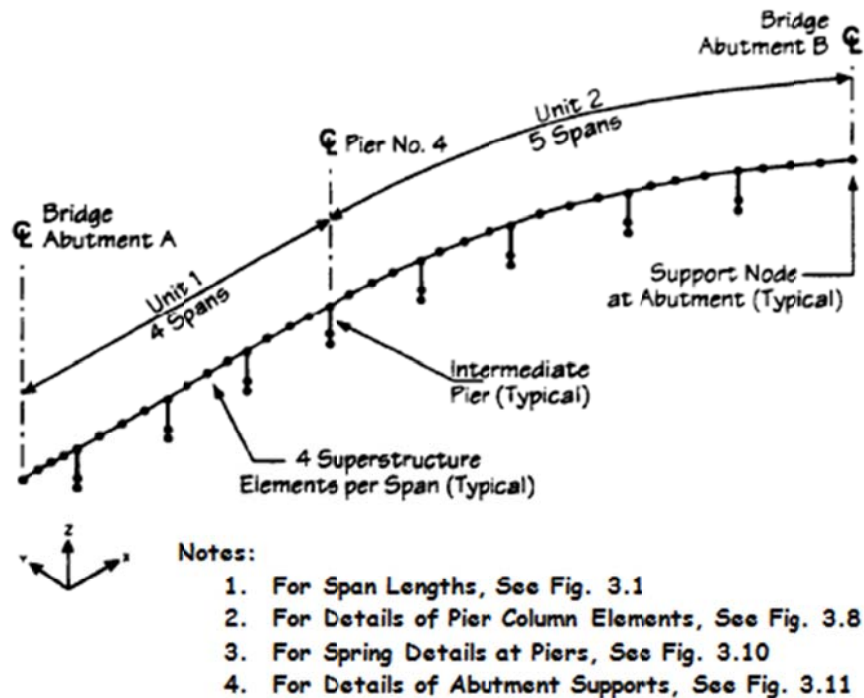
Bridge No. 1 – Finite Element Model of Bridge
